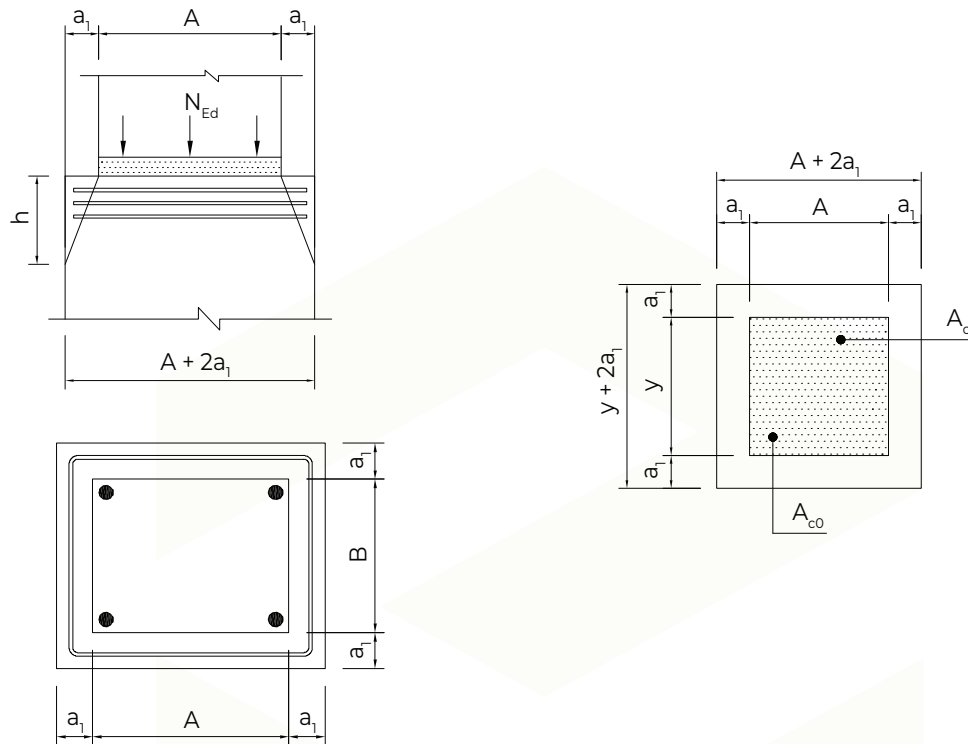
Column connection with different section and required splitting Reinforcement in base column.
